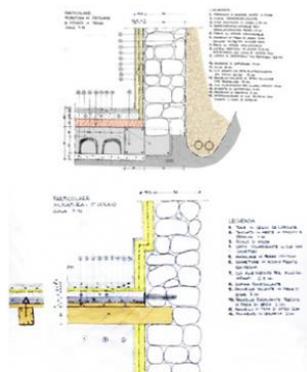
upgrade buildings energy efficiency - study on the stone walls/ étude sur mur en pierres
